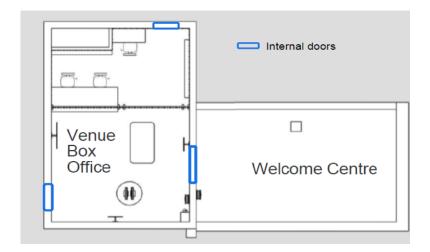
Existing Welcome Centre and Venue Office floor plan.
